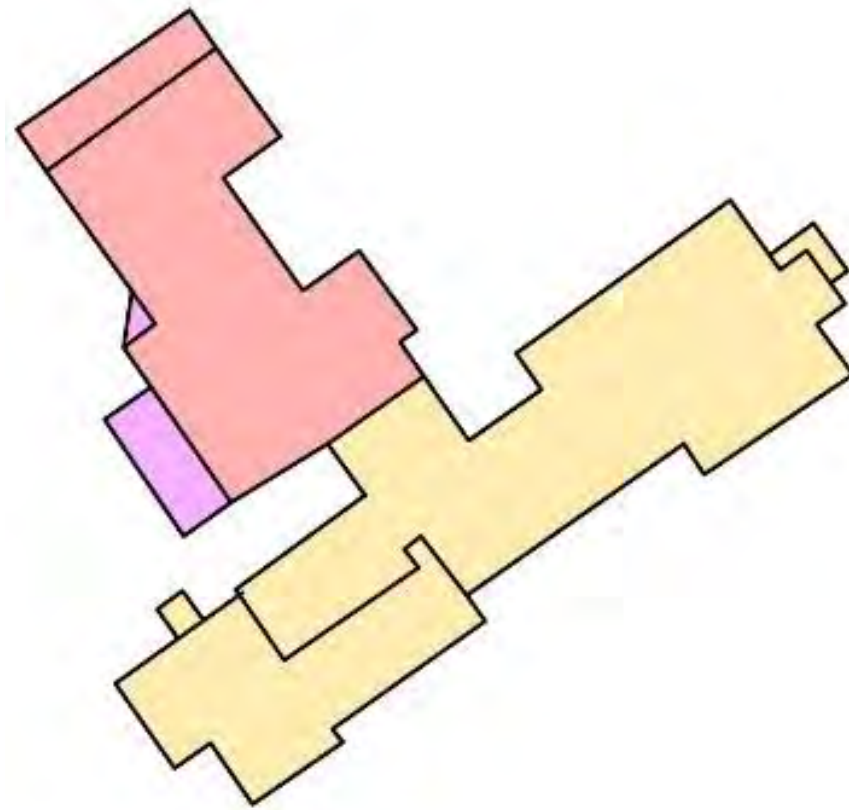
In c.1967, the 18thC house was completely demolished and a new modernist extension was built to the south side. The function of the house changed from a family residence to an old people's home. The interior layout was altered and the original floor plan of the Edwardian building became illegible.
